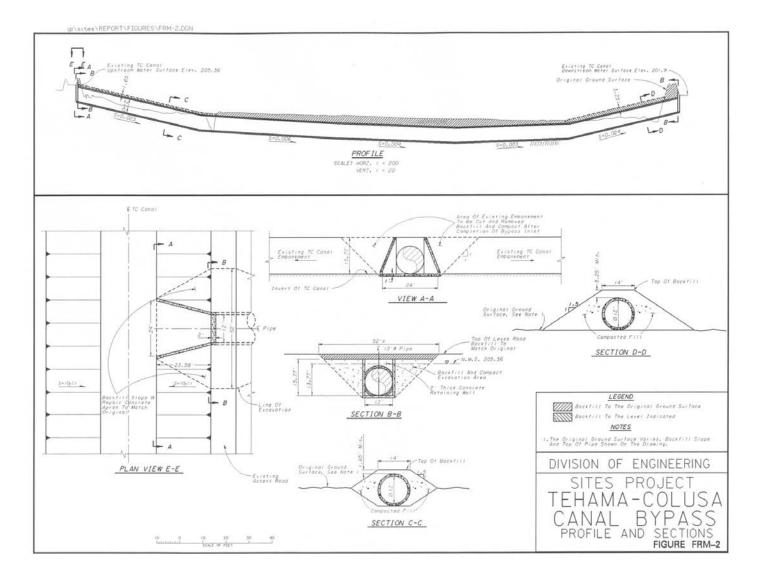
Tehama-Colusa Canal Bypass – Profile and Sections
